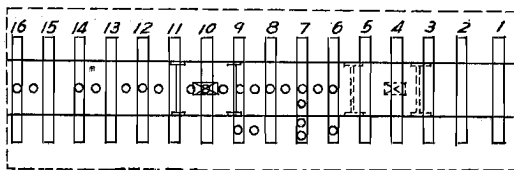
Plan of the test track and the arrangement of measuring apparatus.
